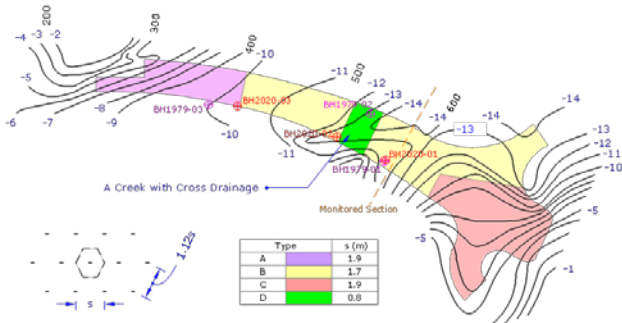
Wick drains pattern, spacing and base level of installation in 1980s
